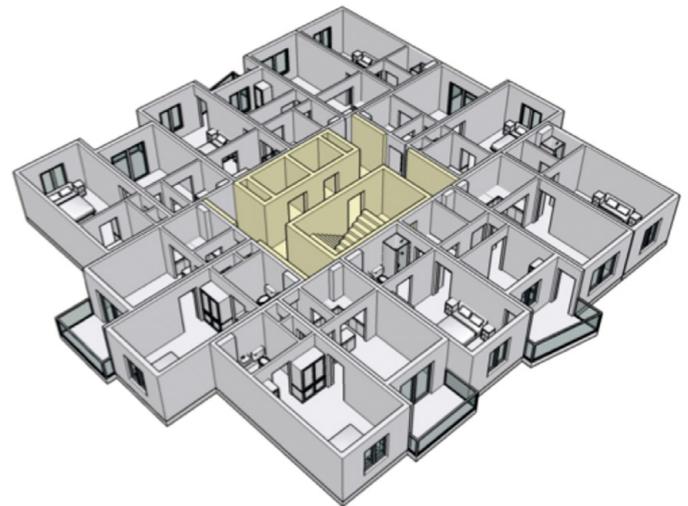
Typical layout of modules in high-rise buildings (courtesy HTA Design)
